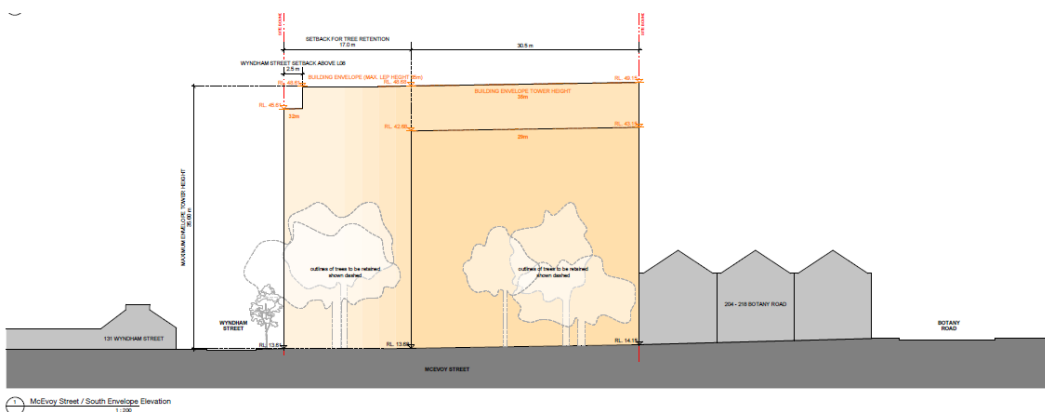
Proposed envelope - southern elevation (McEvoy Street)
